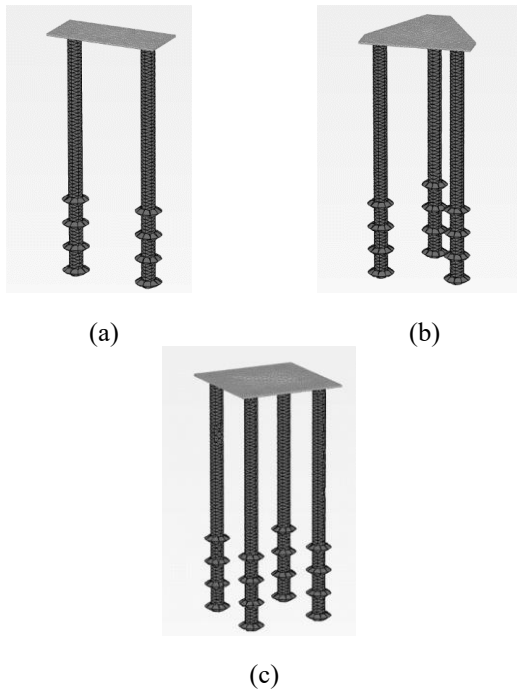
Pile groups (a) 2 pieces linear pattern, (b) 3 pieces triangular pattern and (c) 4 pieces square pattern
